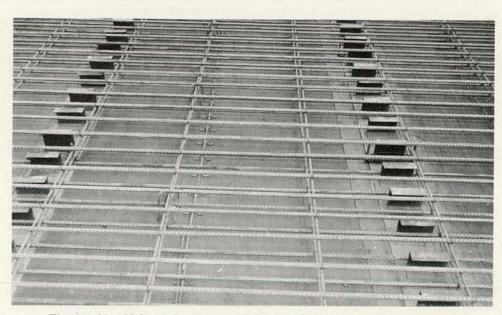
Slab reinforcement and channel shear connectors in composite steel beam bridges.
